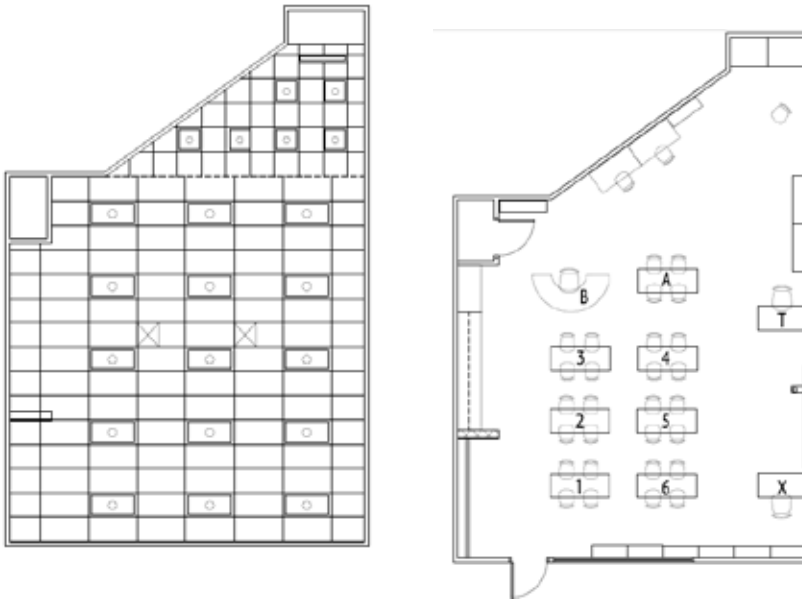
Classroom Reflected Ceiling Plan on Left and Classroom Furniture Plan on Right
